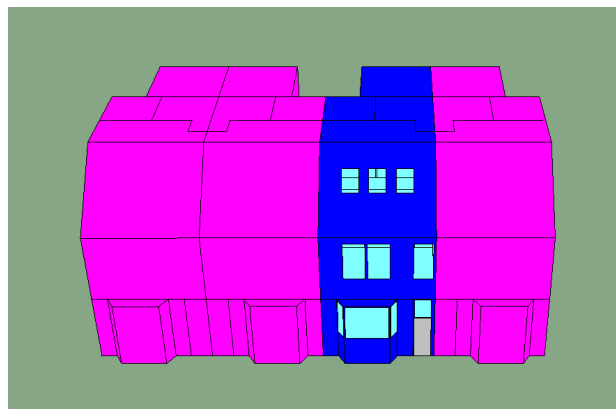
Typical dwelling (highlighted in blue) in a terraced configuration.
